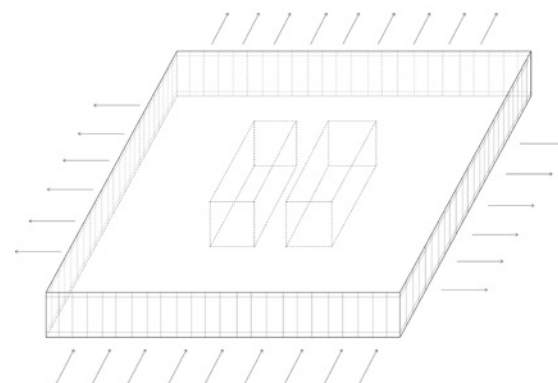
A typical floor plan and the wind direction with positive and negative pressure.
